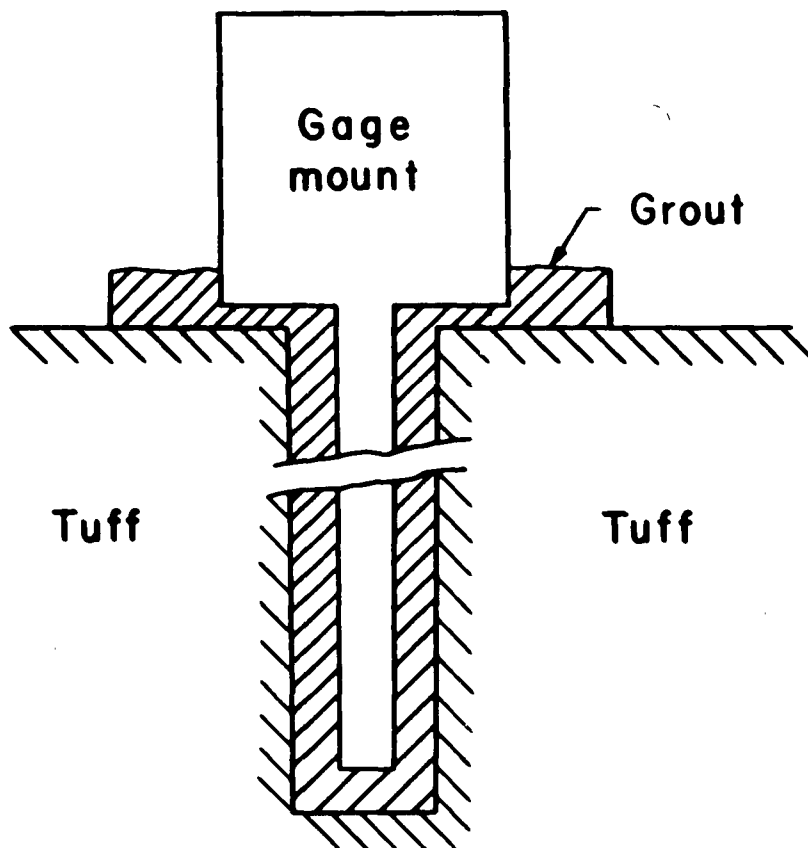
Typical Gage Mount Installation- Surface Test.
